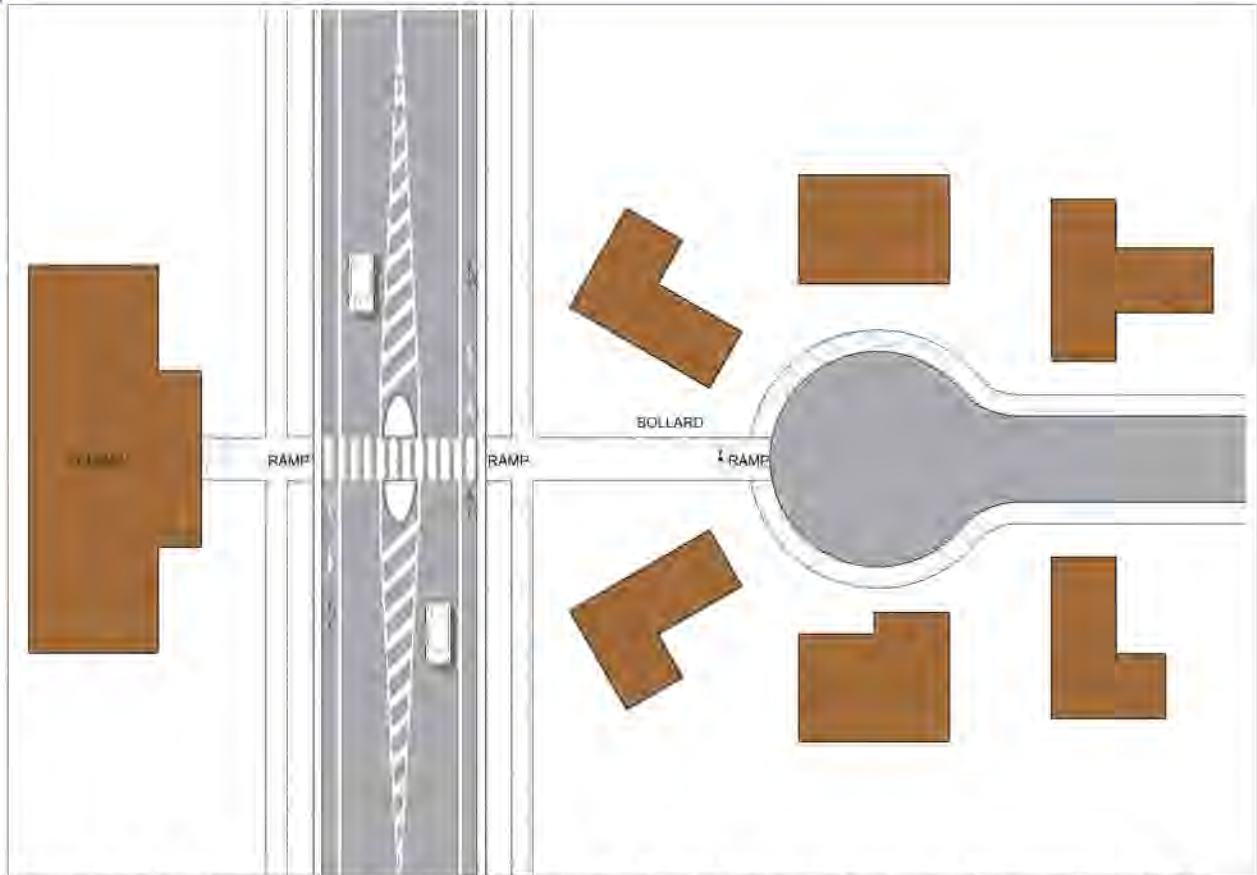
Overland connector trails can create direct linkages between destinations that would otherwise require out-of-direction travel on streets.
